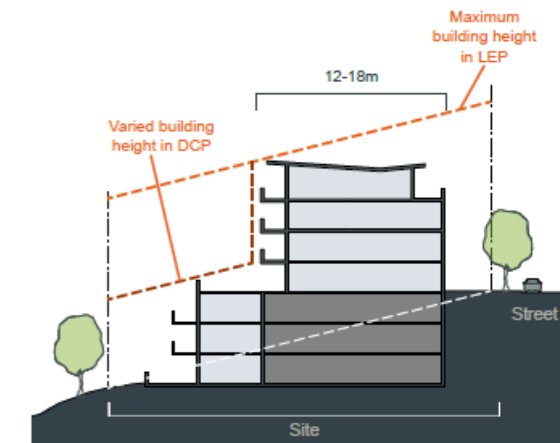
C.4 On steep slopes across sites, a varied height control can be applied that steps down towards the lower level of the site and helps create useful residential floor plates (12-18m) addressing the street
